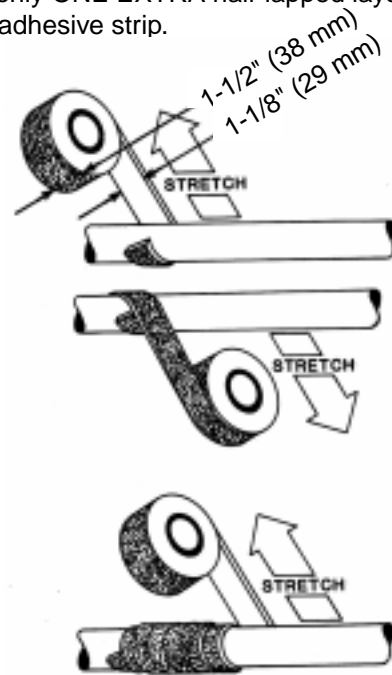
APPLYING LOCK-TAPE STRIP (SEE FIGURE 9)
